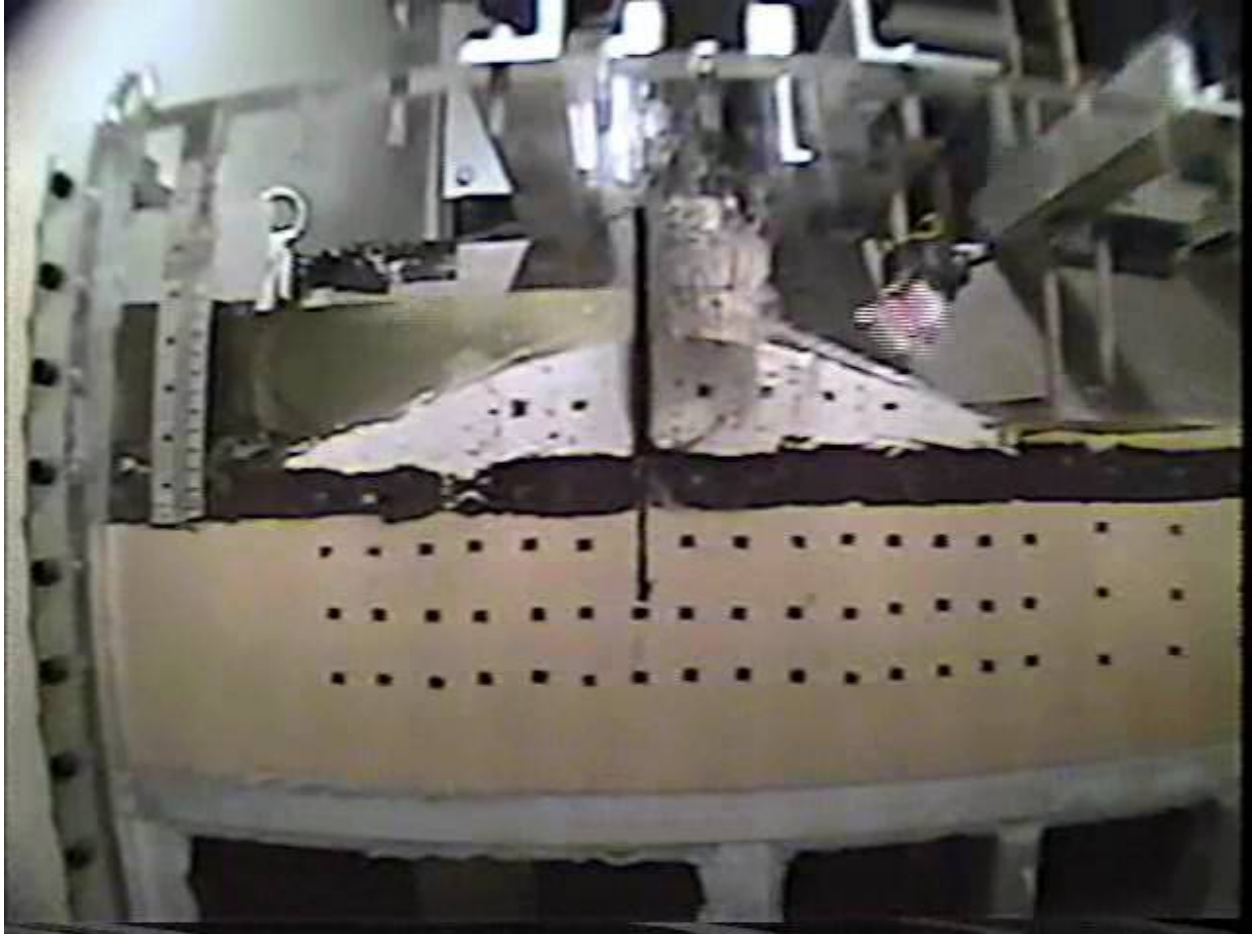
ERDC London Avenue south model at flood level just prior to any wall movement
